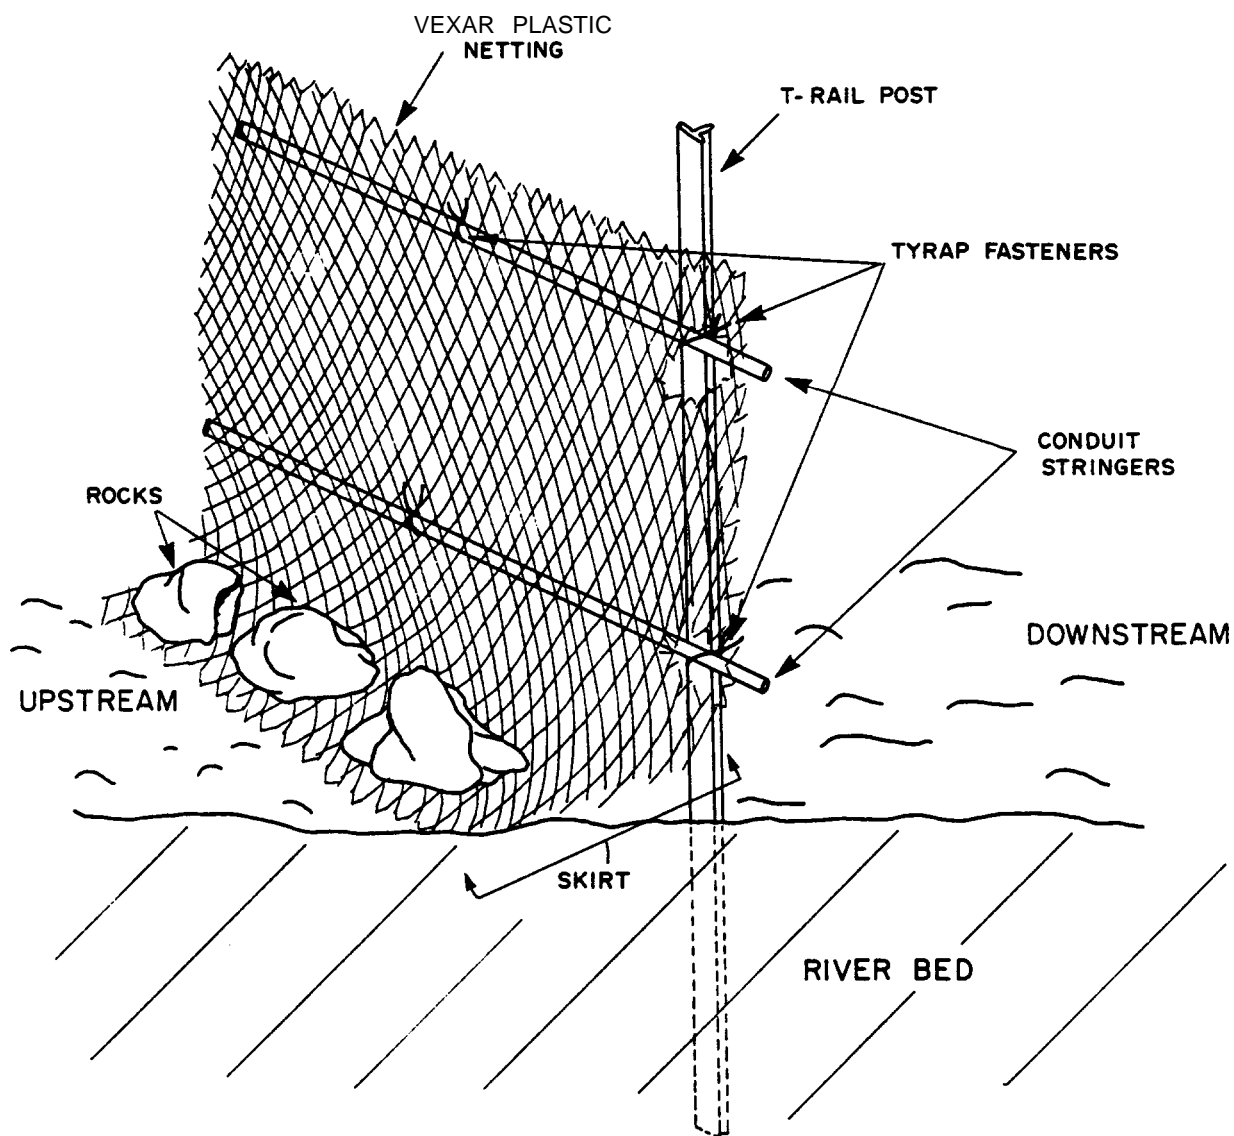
Construction details of the wings of the 'plastic netting weir' used in 1980.
